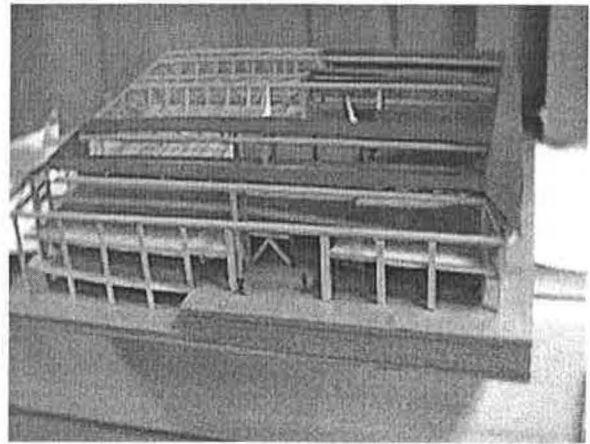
Prestressed Laminated Beam Structure And Its Equilibrium State
